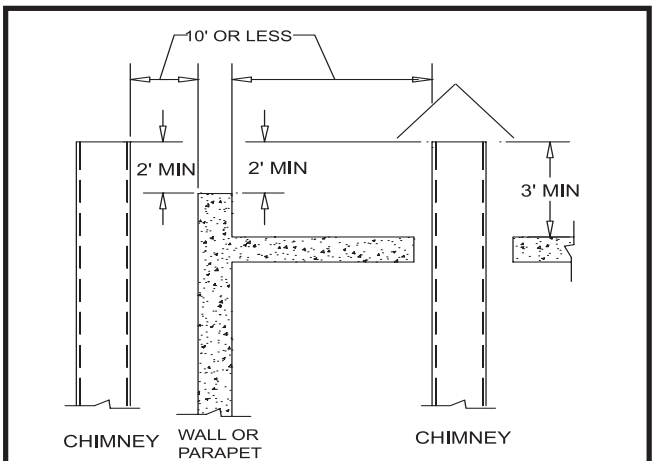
Vent Termination from Flat Roof 10' or Less from Parapet Wall
